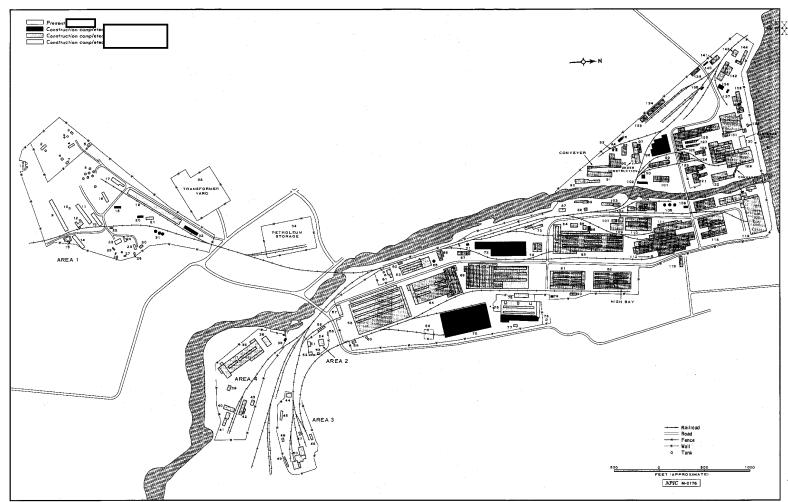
LAYOUT OF ARMS MACHINE AND STEEL PLANT 235, VOTKINSK, USSR.
